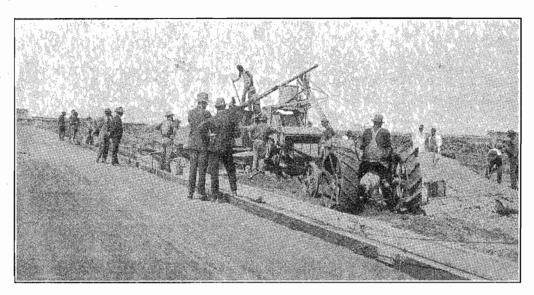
Prince's Highway West, west of Point Cooke-road. Construction of concrete widening slabs.
